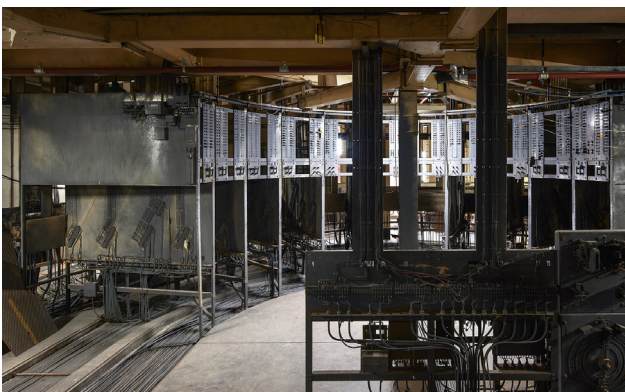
Cable Room in the Control Room Building, November 2023 (courtesy of Chris Bennett: Evolving Picture).
